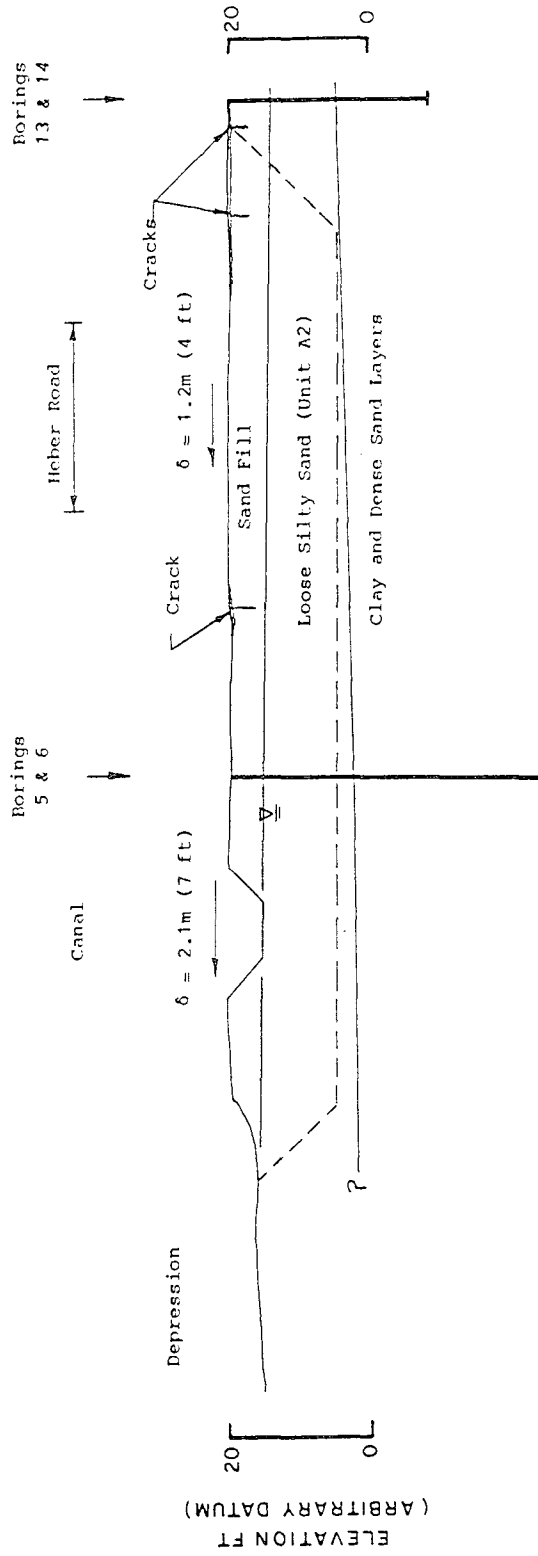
HEBER ROAD SITE - CROSS SECTION
